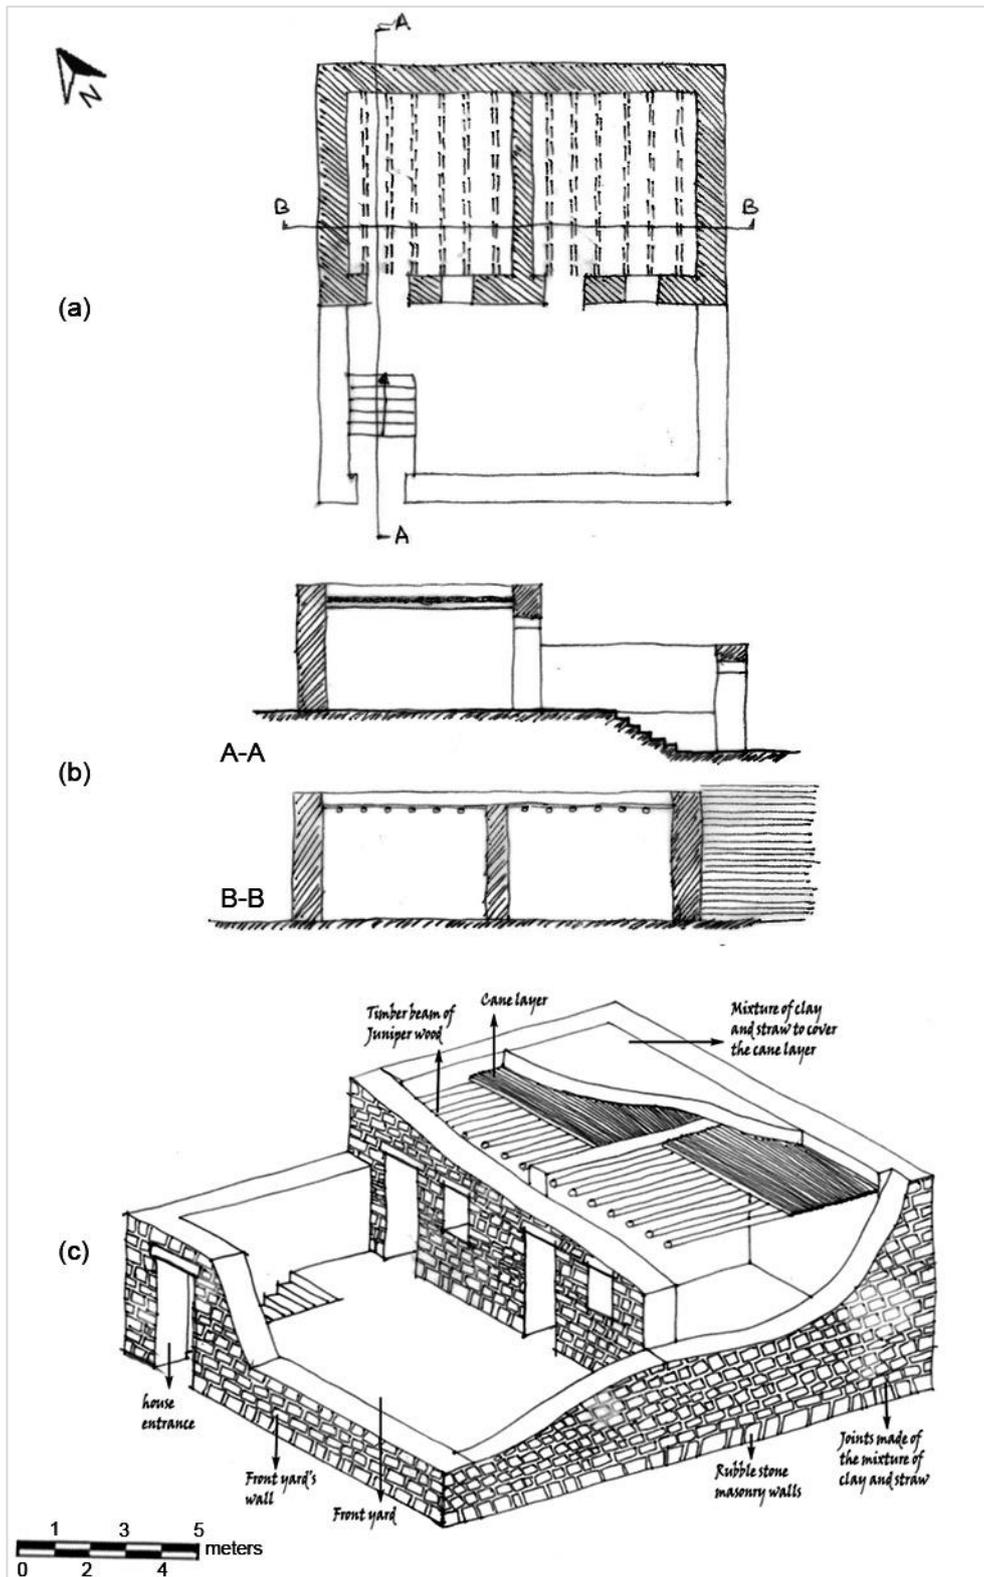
House D, an example of a house with a front yard: (a) plan; (b) section; (c) axonometric (Author 2019)
